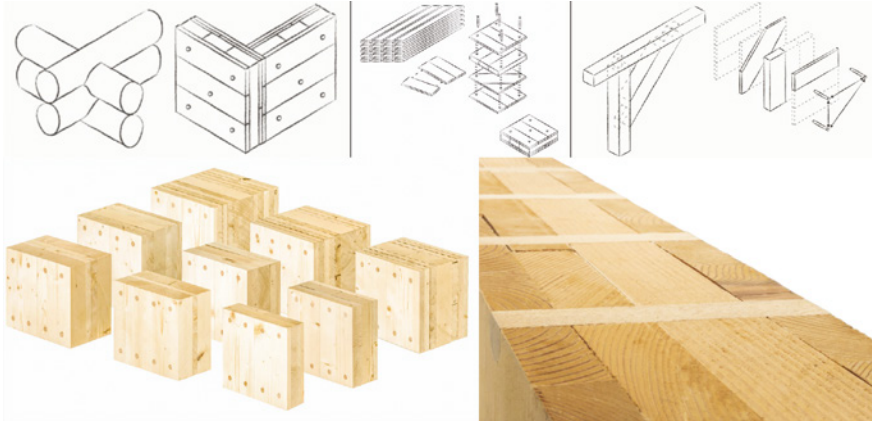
Concept and Assortment of Rombach Holz100 DCLT (Rombach Bauholz + Abbund). (Top) (left) Solid timber log construction as antetype for DCLT; (middle) setup of layers at 0, 45 and 90° orientation; (right) traditional carpentry bracing as antetype for 45° layer. (Bottom) (left) Assortment of Holz100 DCLT variations; (right) section detail of swelling dowel. (Thoma Holz)
